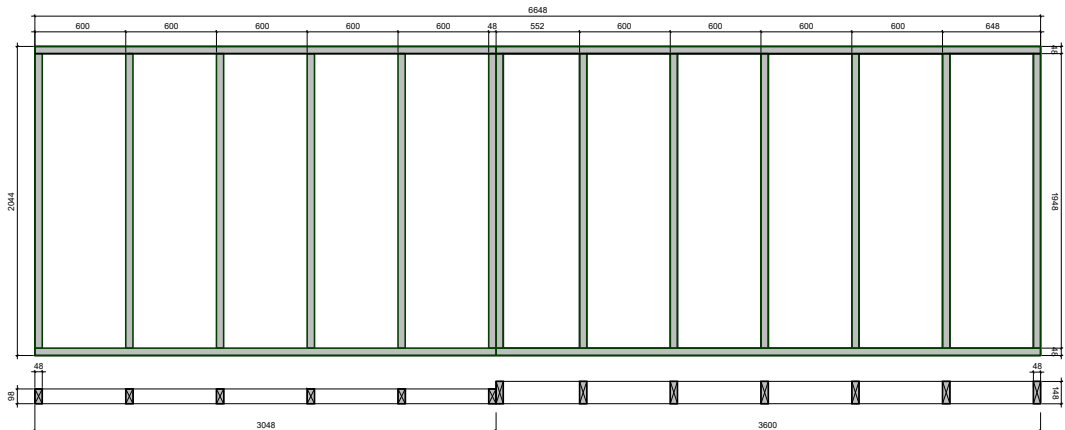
CONSTRUCTIONAL FLOOR PLAN AFTER BUILD
